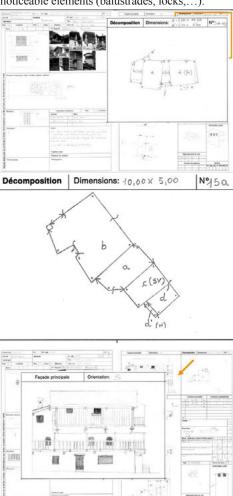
Planimetric breakdown in Gressoney-Saint-Jean and planimetric breakdown Arvier.
